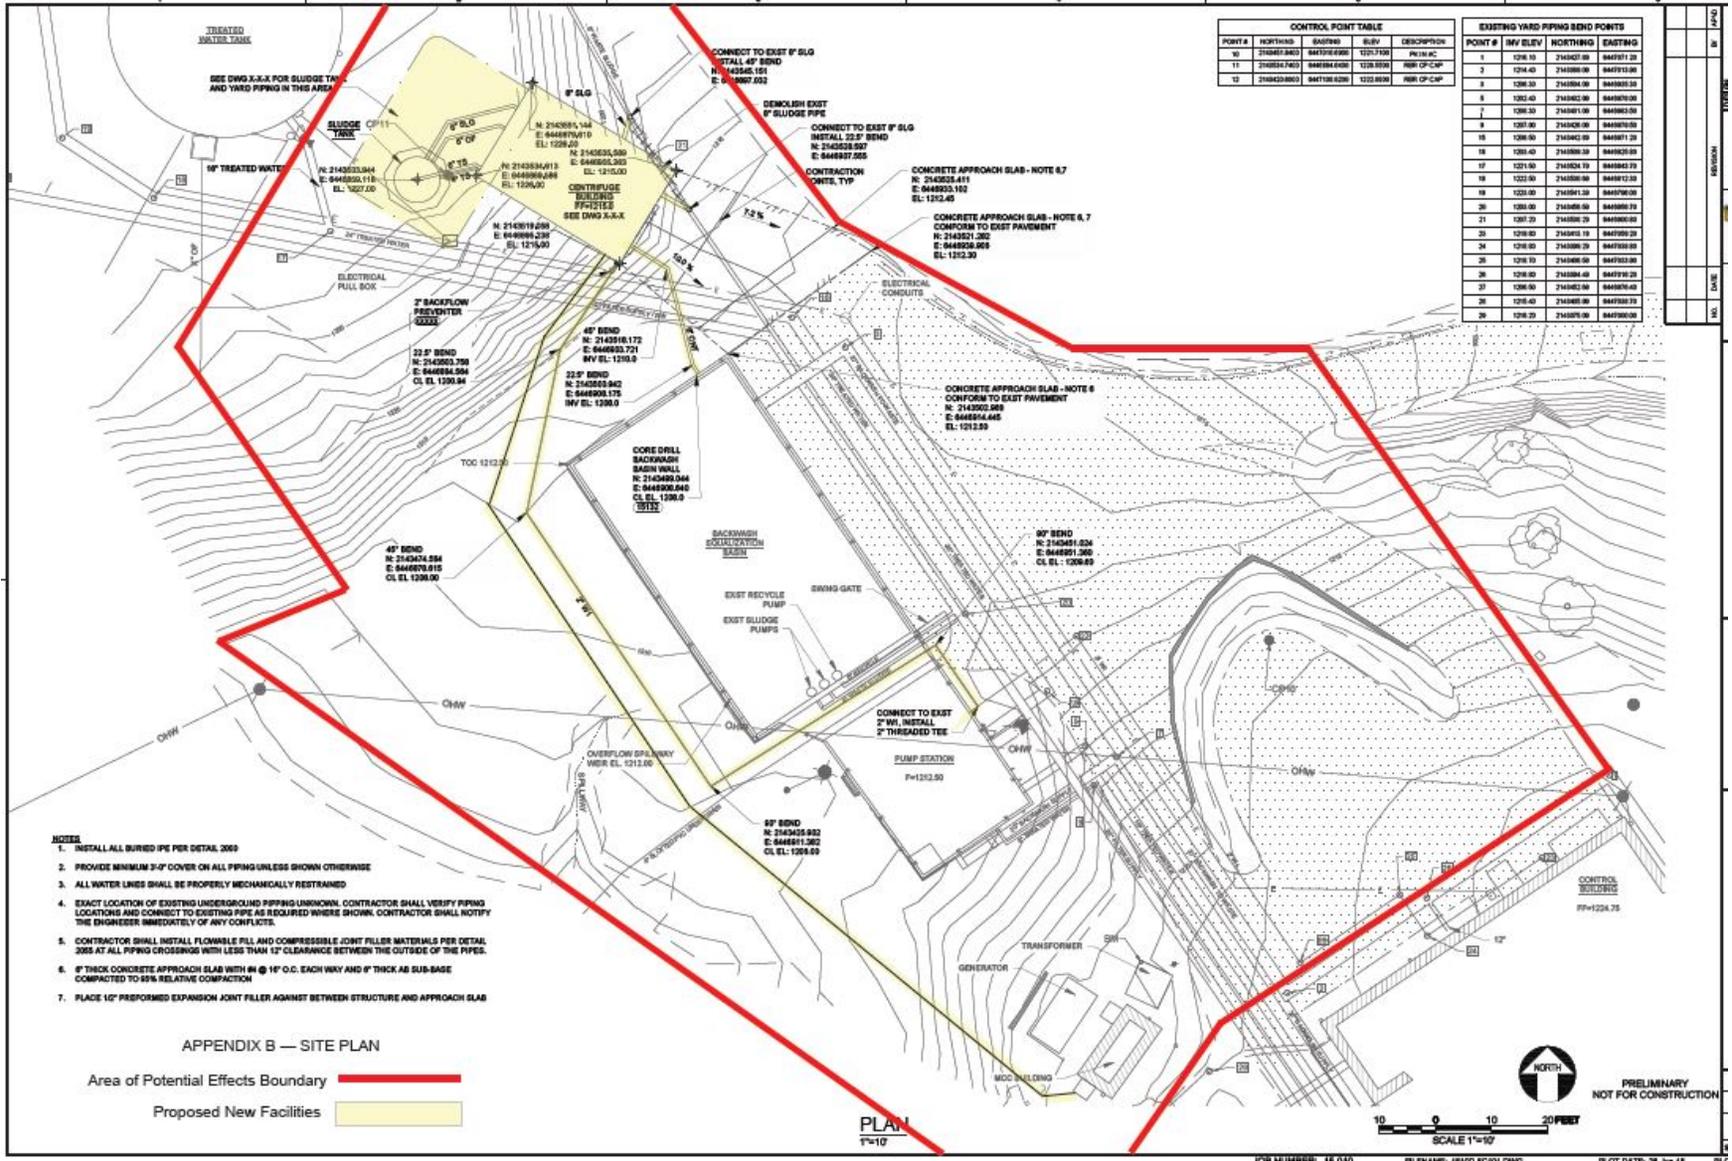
Plan view depicting proposed facilities and elevations courtesy Waterworks Engineers via Quercus.
